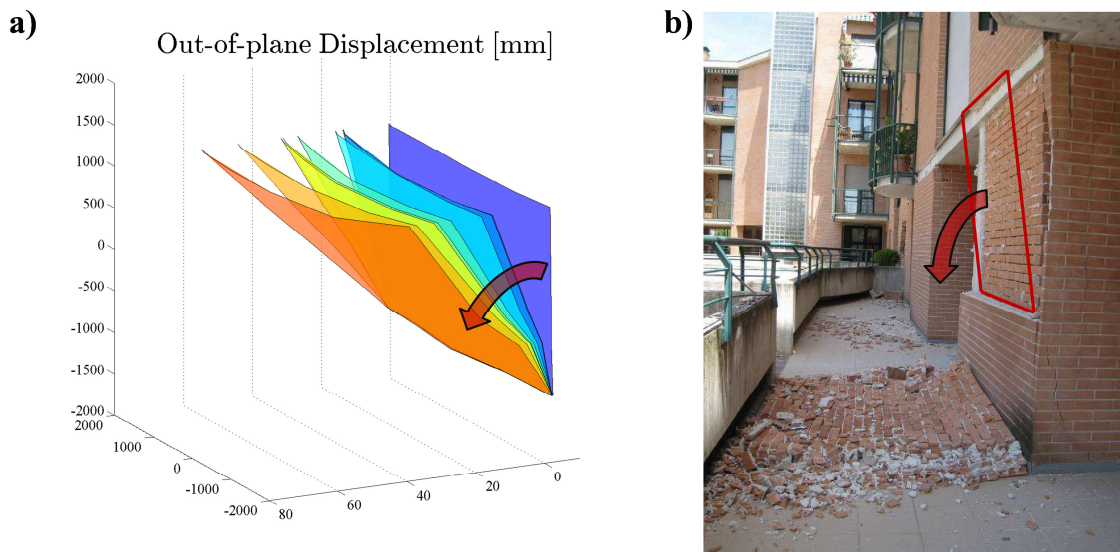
(a) Simplified reconstruction of the out-of-plane tested wall failure; (b) Field evidence of a masonry enclosure wall failure.
